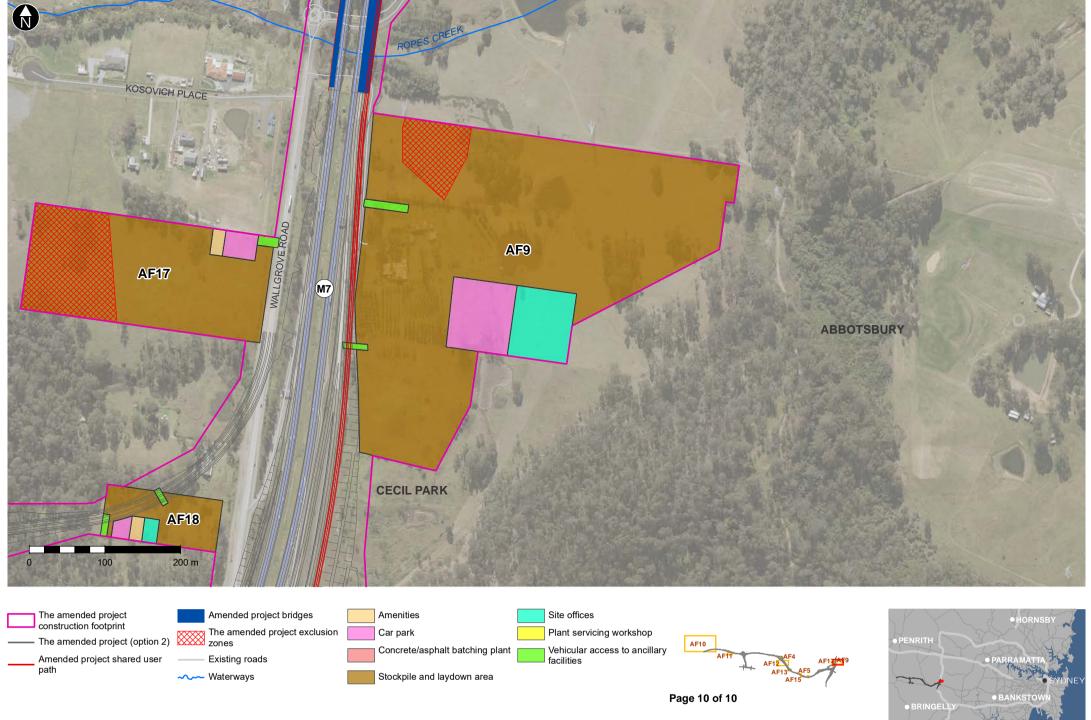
Access points for the additional and amended construction ancillary facilities
